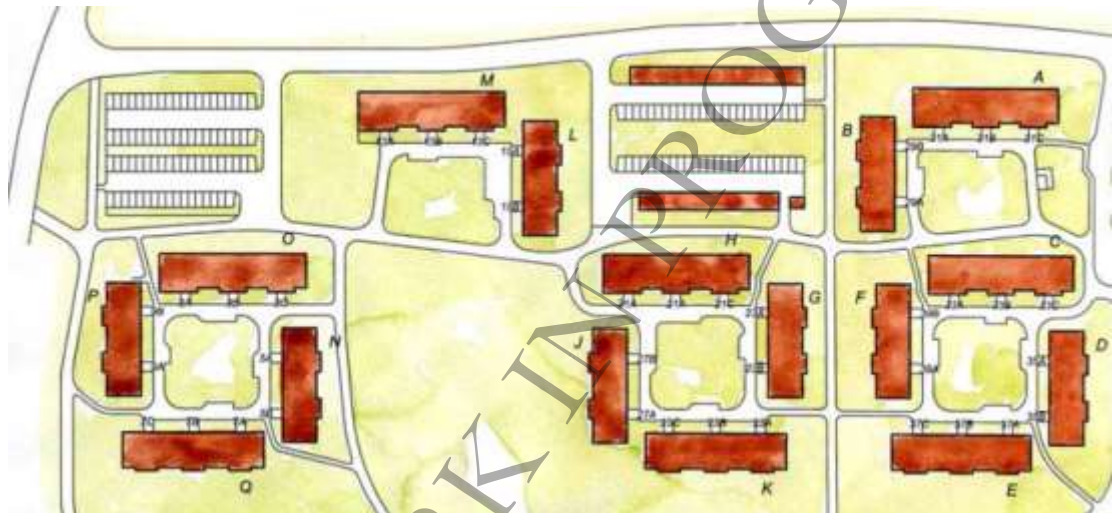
Site Plan of the Brogården area (Alingsås – Sweden) (Alingsashem, 2013)
